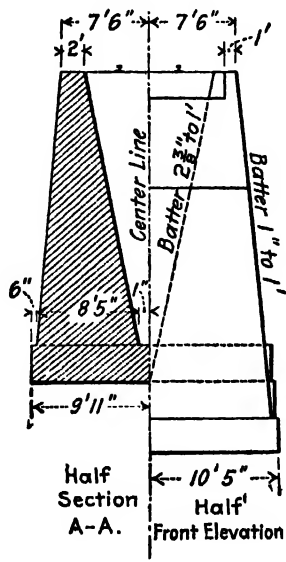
Typical Plain Concrete U-Abutment, Chicago, Milwaukee and St. Paul Railway.
